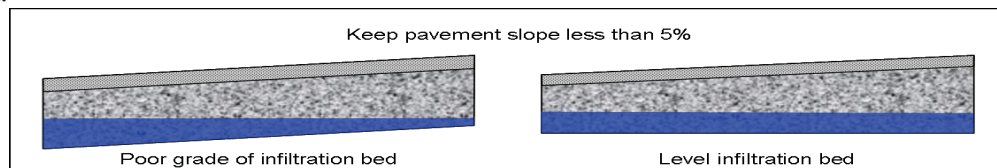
A level infiltration bed and limited pavement slope will maximize stormwater treatment and storage.
